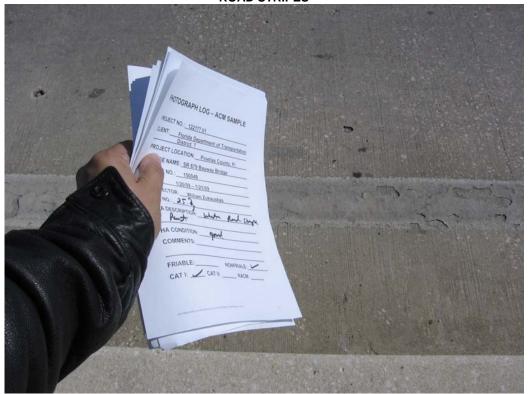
01/21/09 - SAMPLE 25.3 - HA 25 WHITE PAINT ROAD STRIPES
